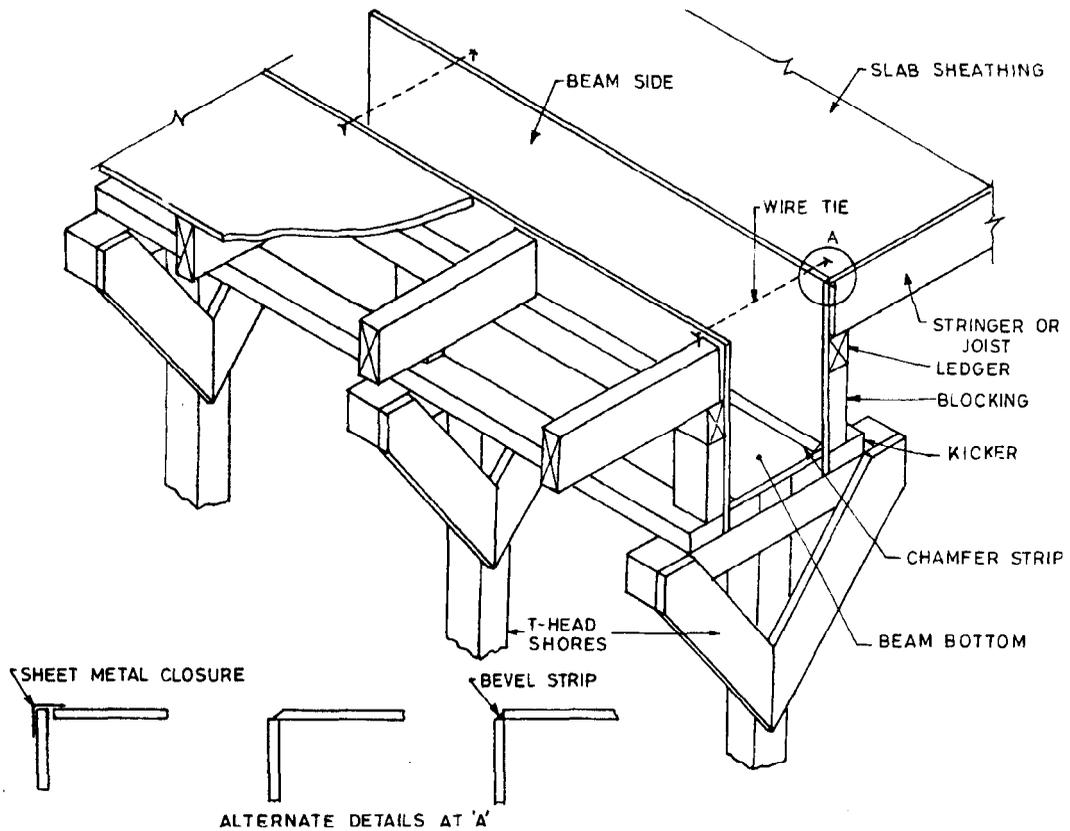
TYPICAL COMPONENTS OF BEAM FORM WORK WITH SLAB FRAMING IN
